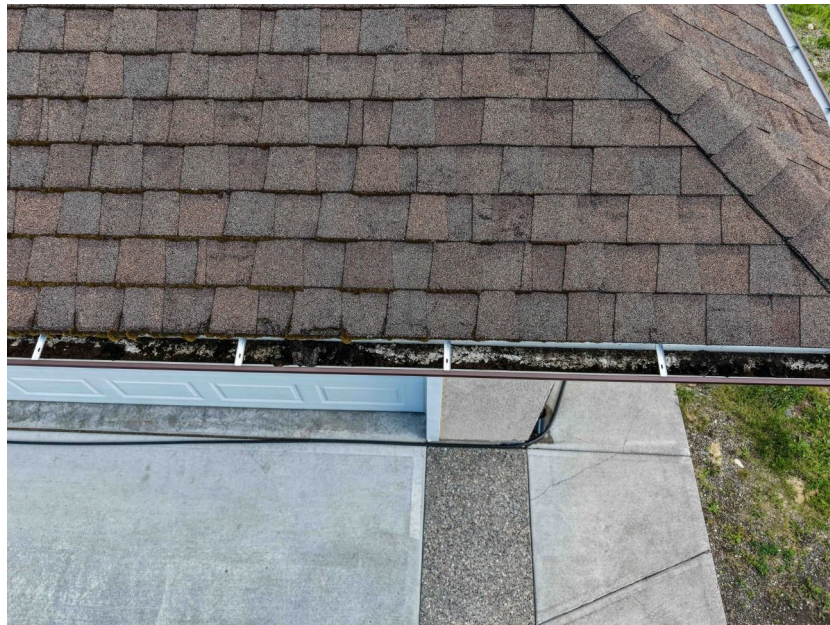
Overview — Drainage / Gutters and Downspouts, North.
